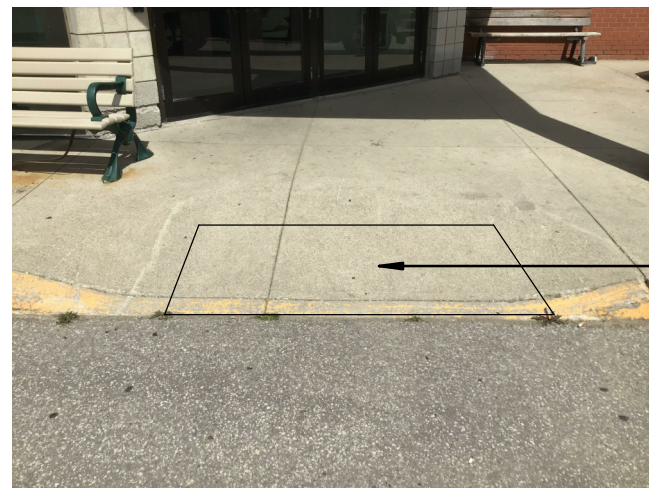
EXISTING ENTRANCE / EXIT, EXISTING CURB RAMP
